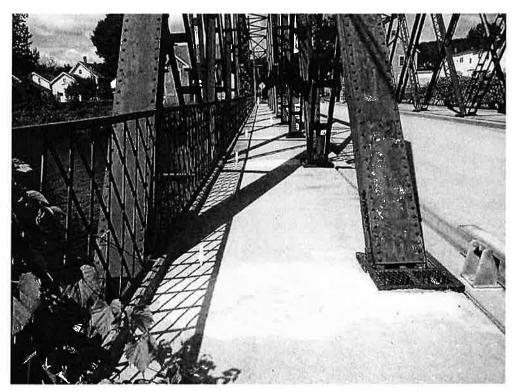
South sidewalk, span 2, at L18, looking west - concrete patch repair at the transverse joints.
